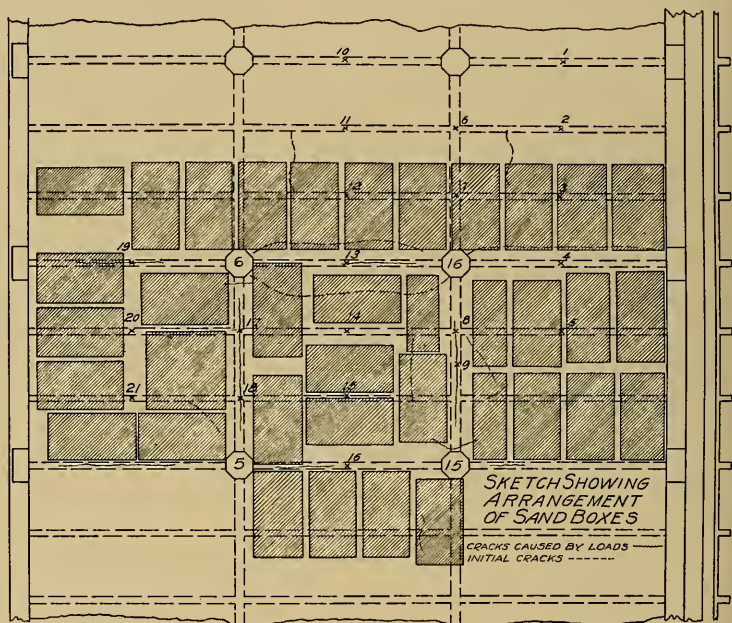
LOCATION OF SAND BOXES AND FLOOR CRACKS.
